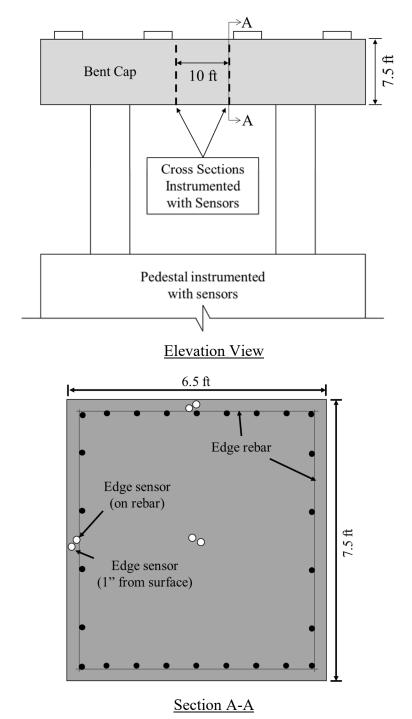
Scottsboro bent cap instrumented cross section locations (top) and temperature sensor locations on these cross sections (bottom)
